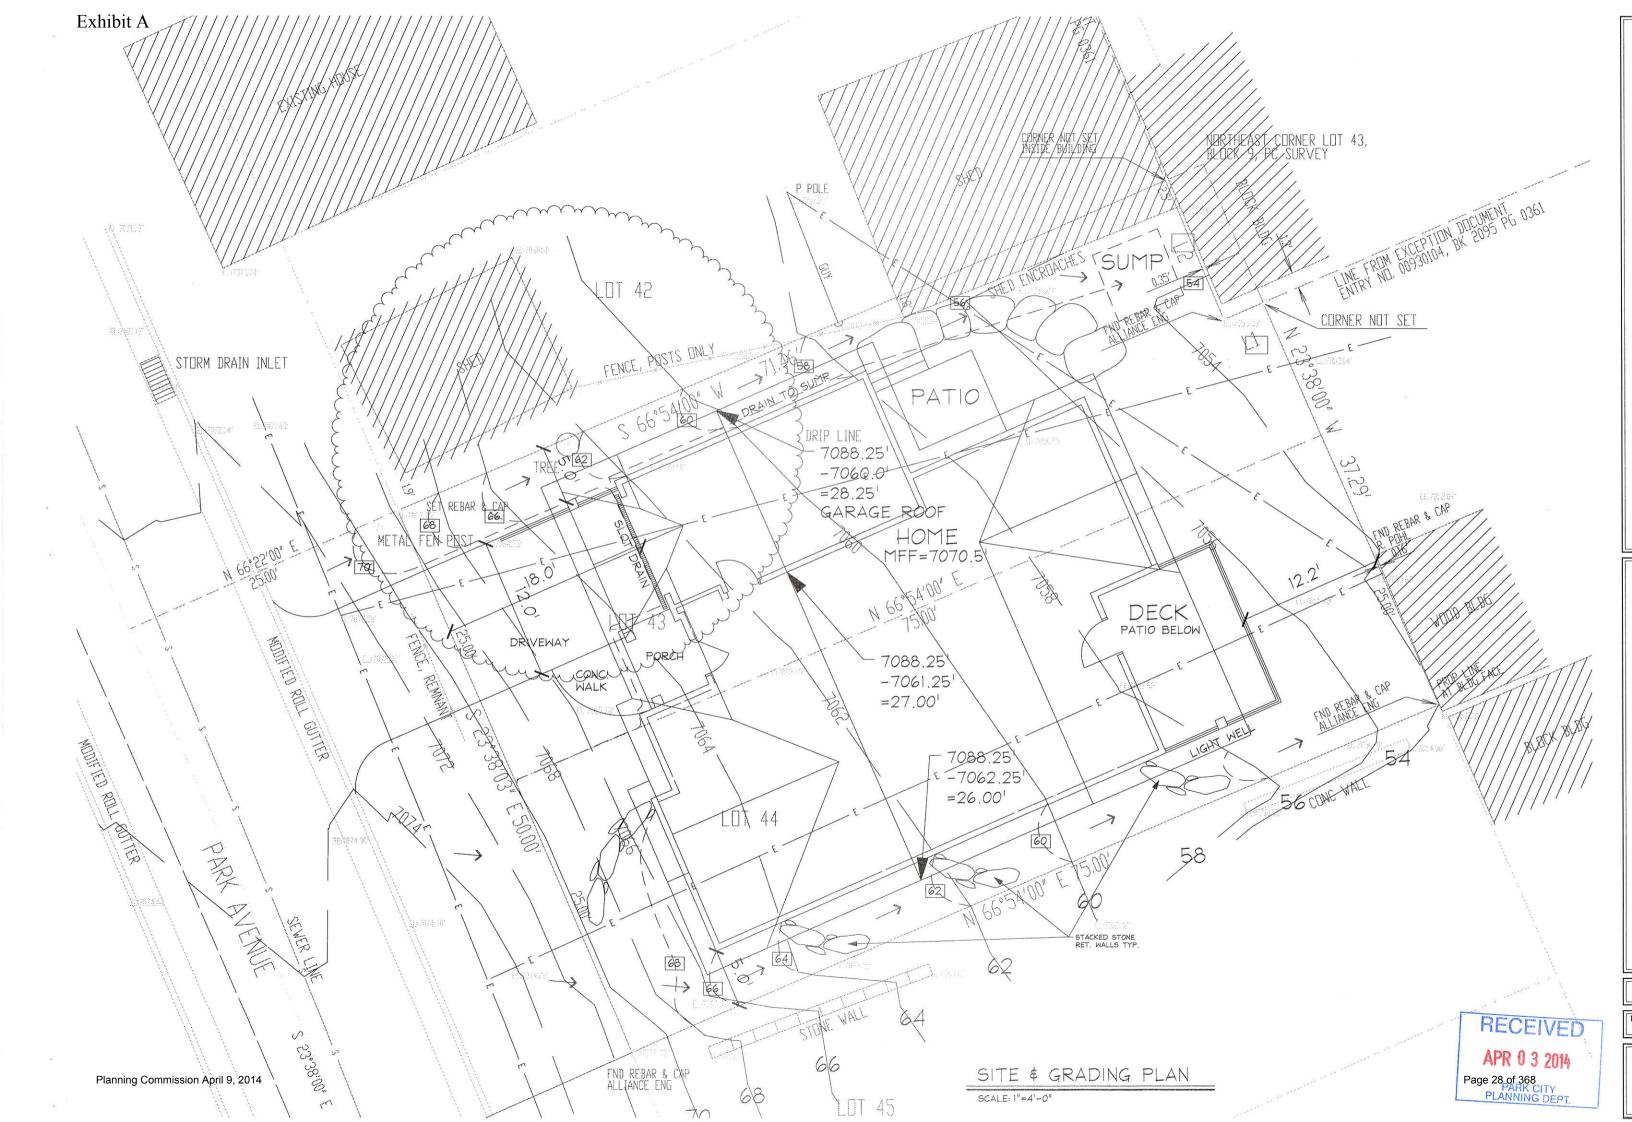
Exhibit A- Plans (existing conditions, site plan, elevations, floor plans)
